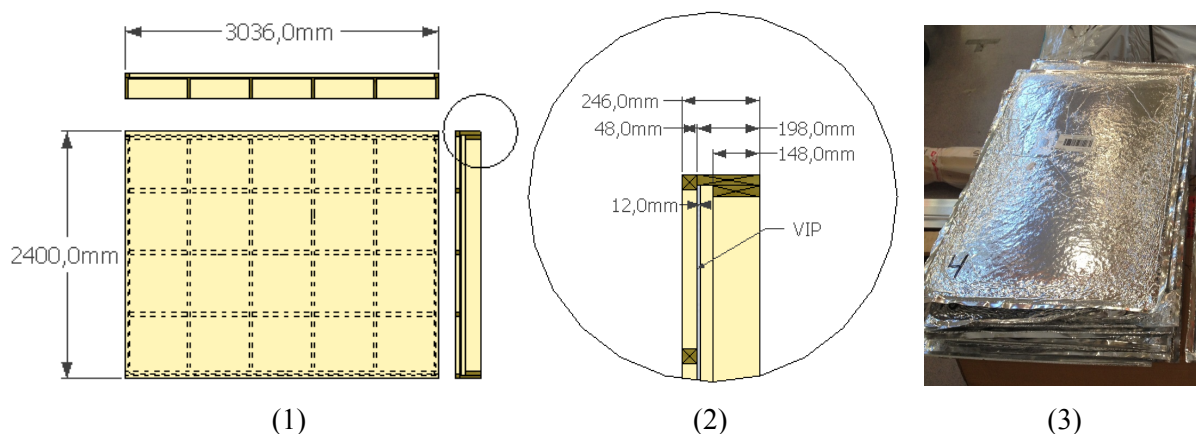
Timber frame wall element (1), details (2) and VIPs (3)
